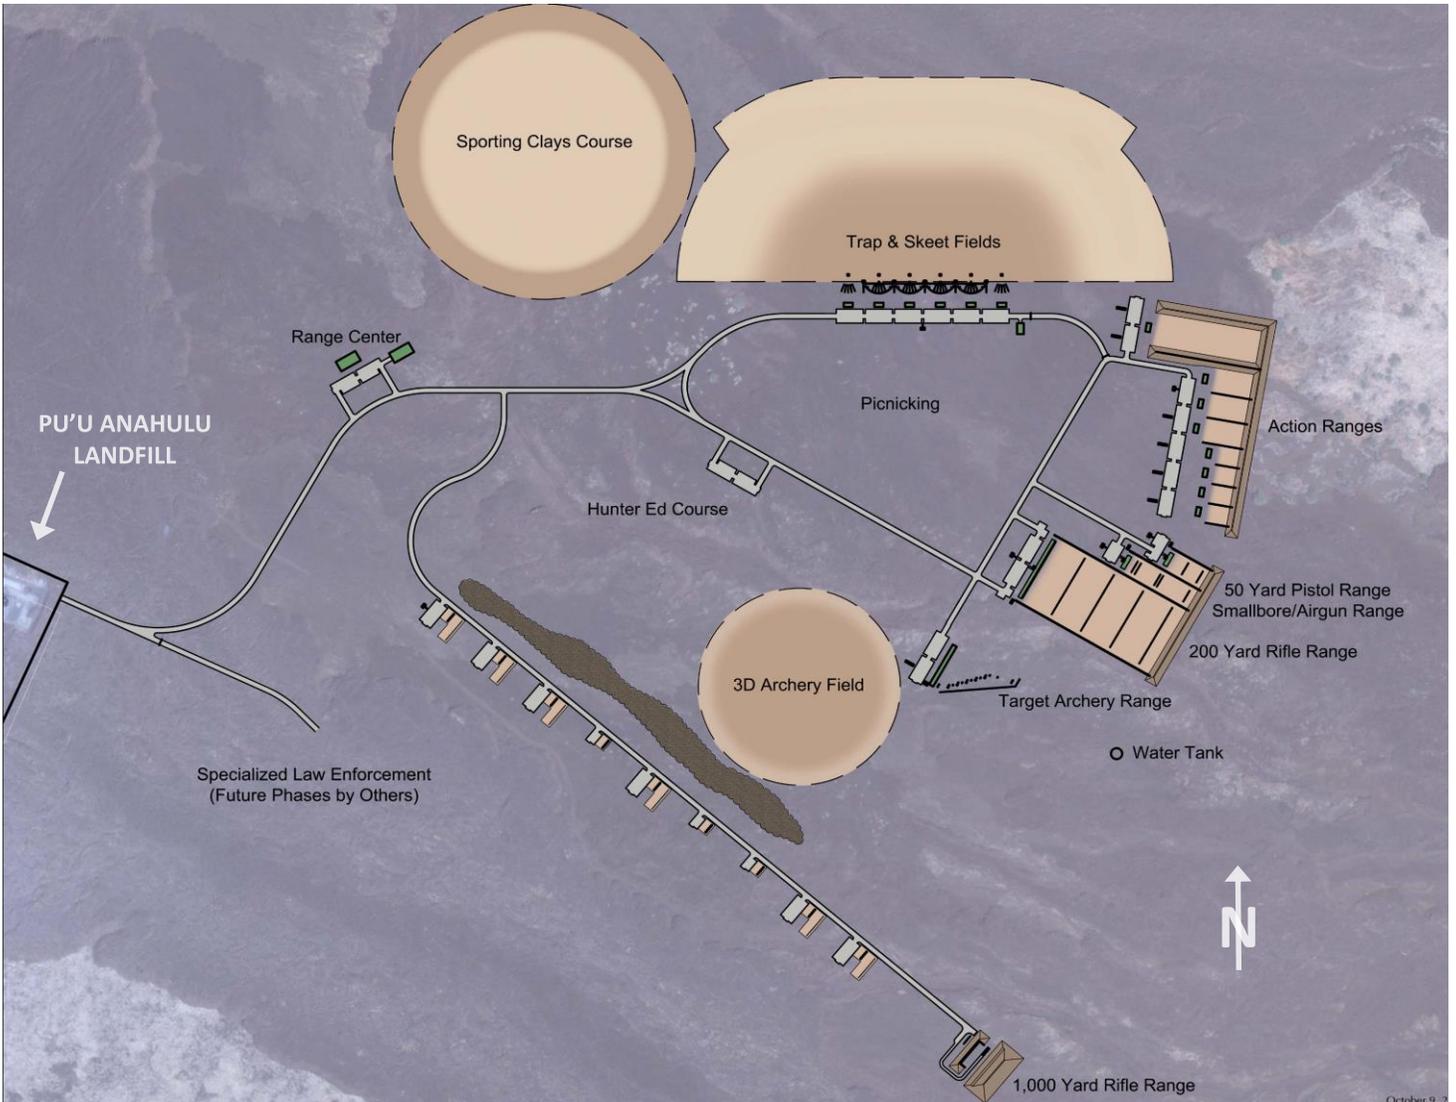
Proposed Pu'u Anahulu Public Shooting Range Schematic Layout
